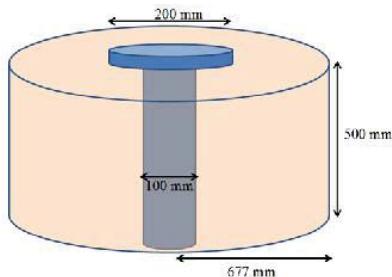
Schematic of single stone column and soil container used in numerical analyses
